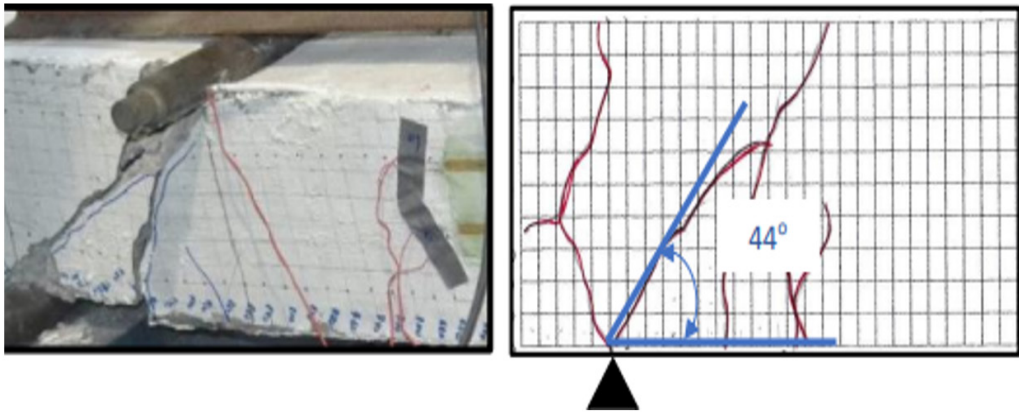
Critical crack width (CDC) of beam specimen (SCCBESP1.0)
